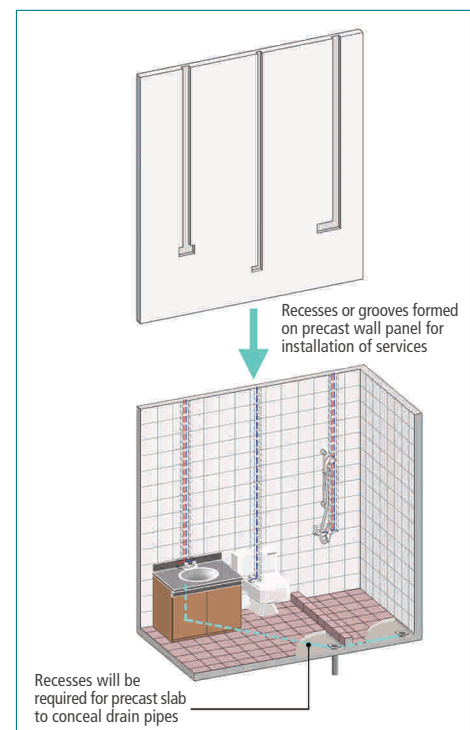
Services can be concealed within the precast wall or slab panels using recesses
